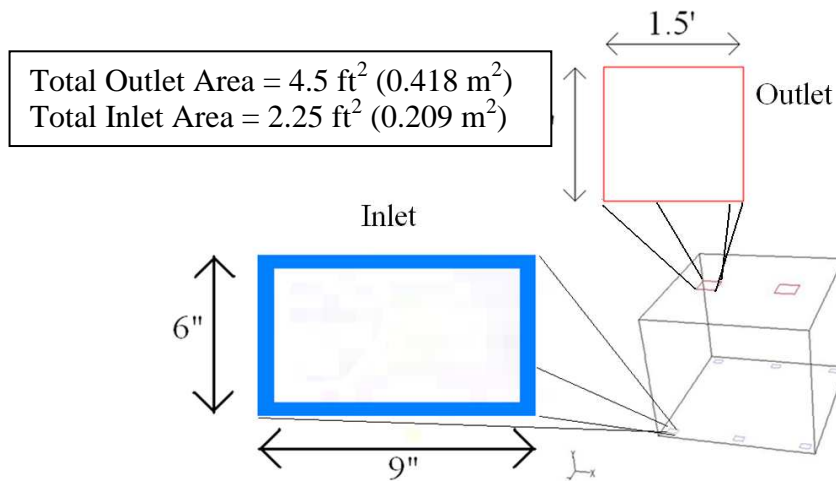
Room 2 vent sizes in the ceiling and the floor
